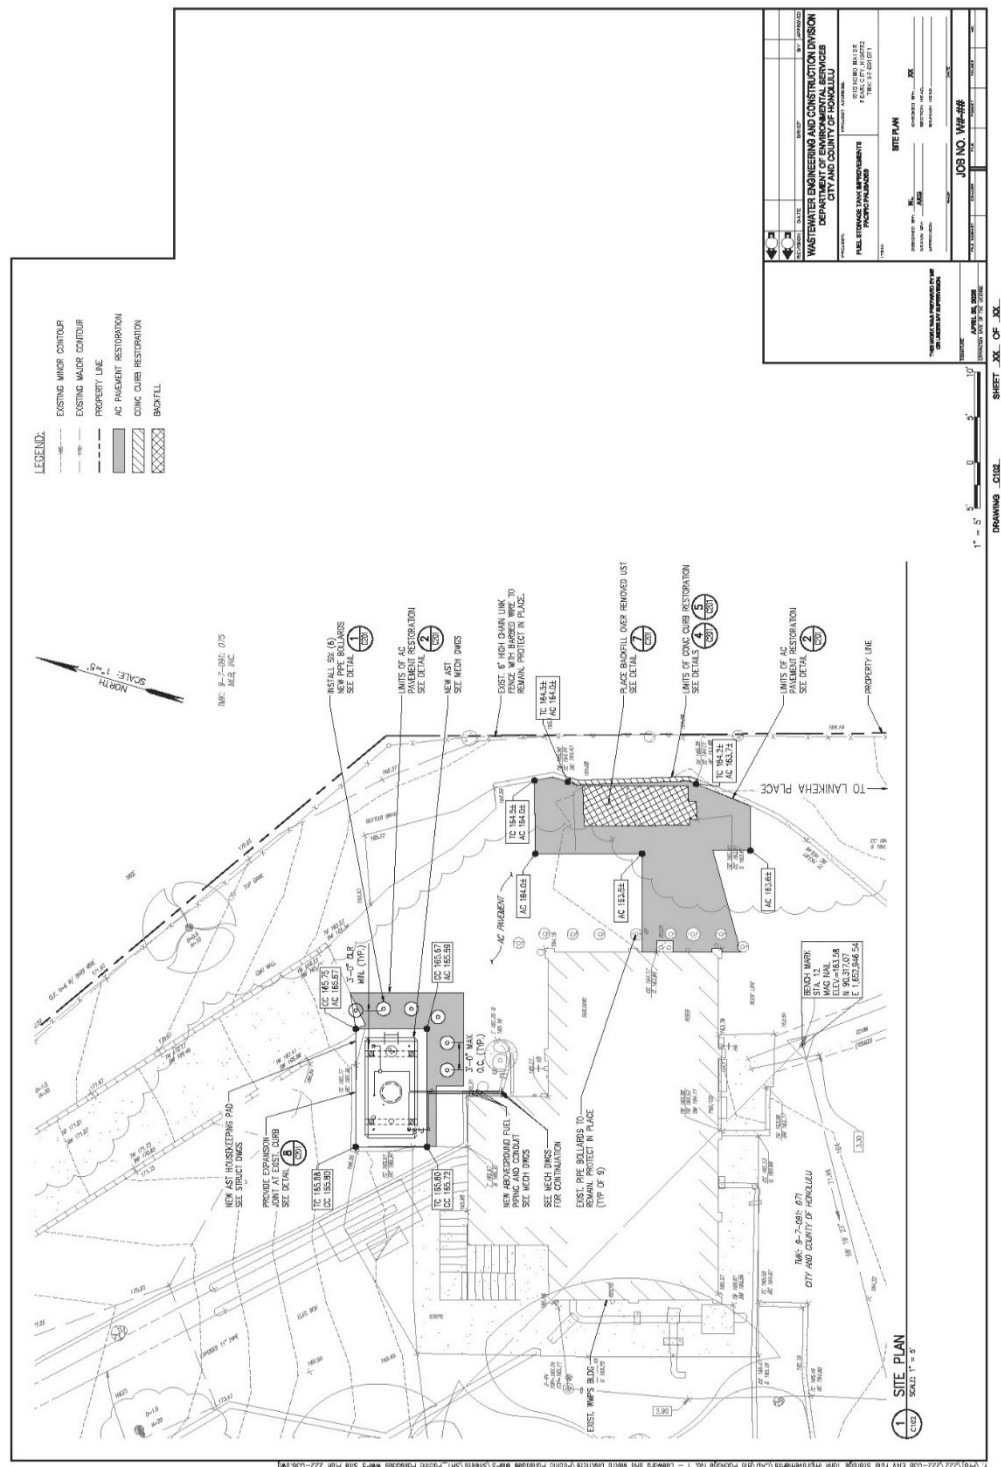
Site Plan with Proposed Actions (Okahara and Associates, Inc., 2025)
